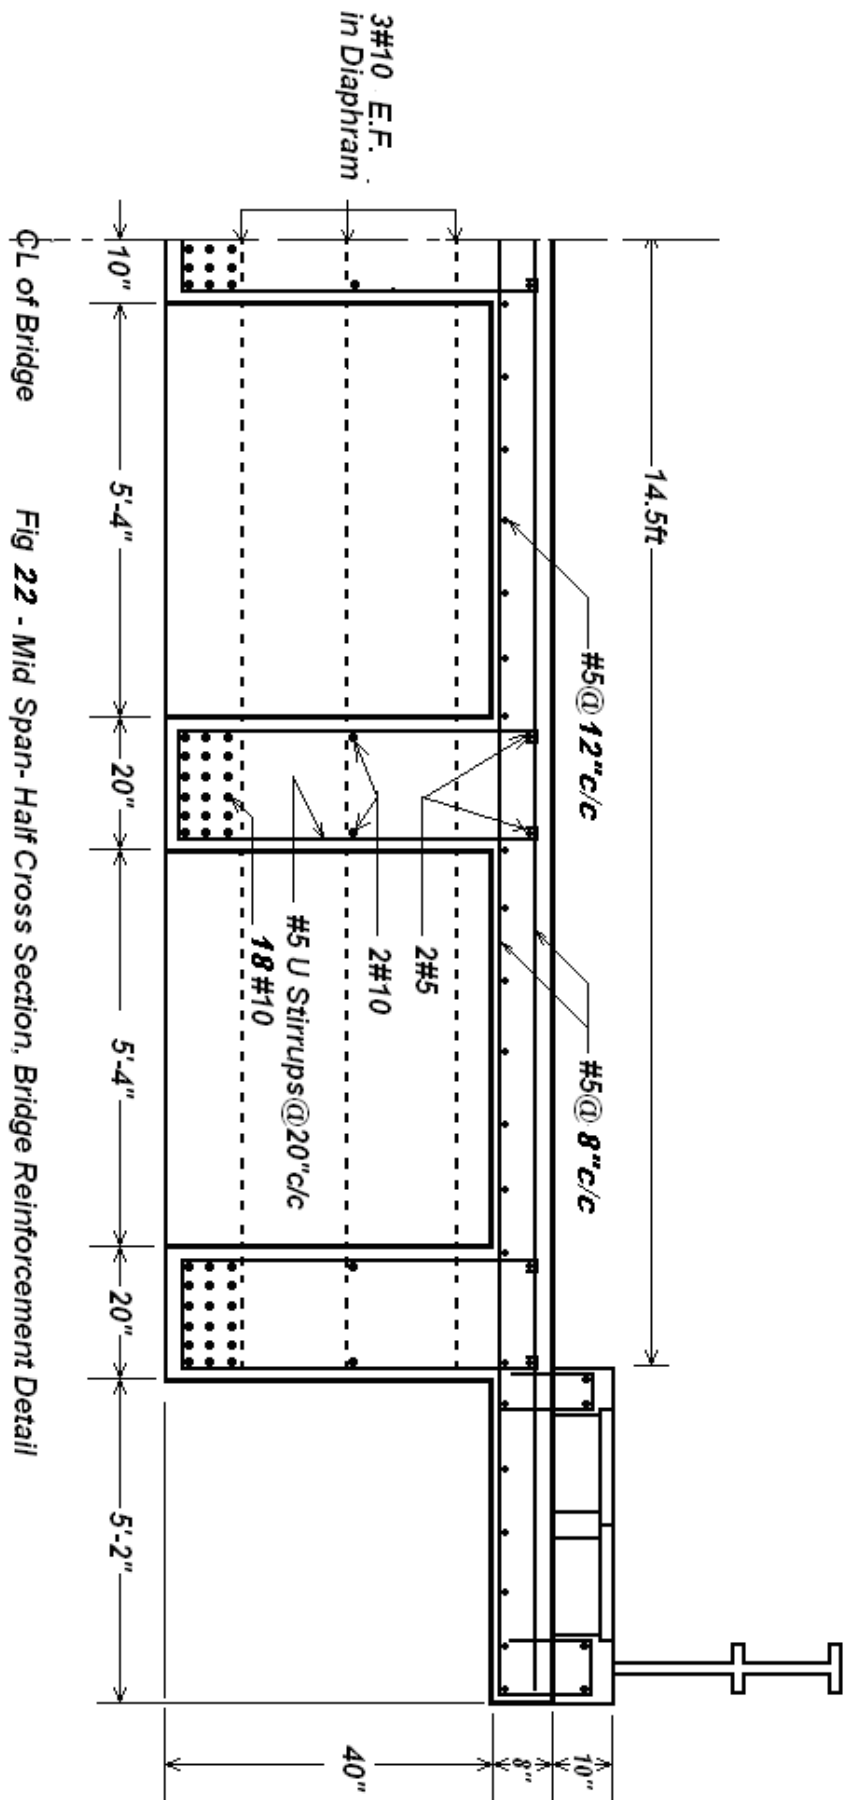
Mid Span-Half Cross Section, Bridge Reinforcement Detail
